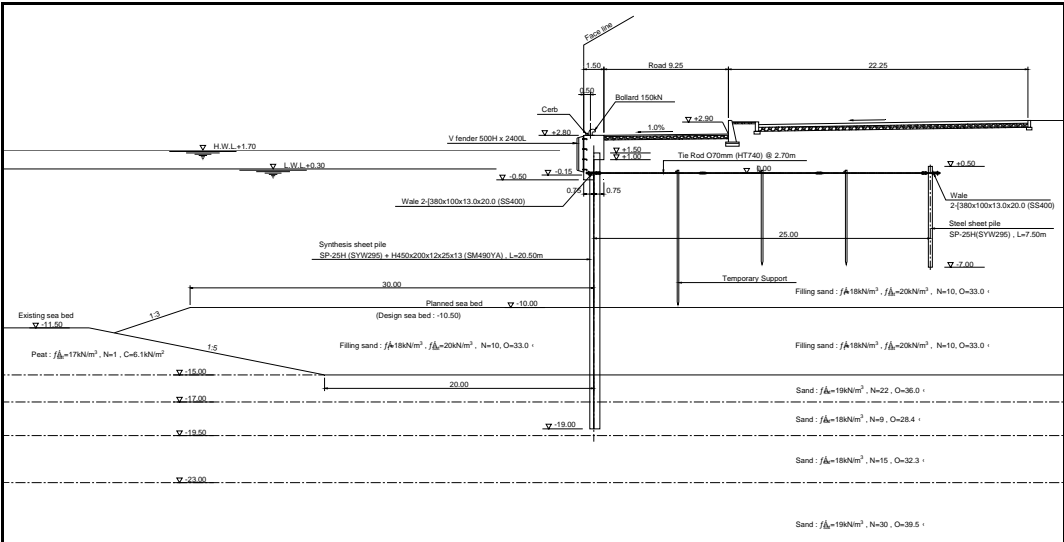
Typical Section of -10m NSQ for Tug Boat
